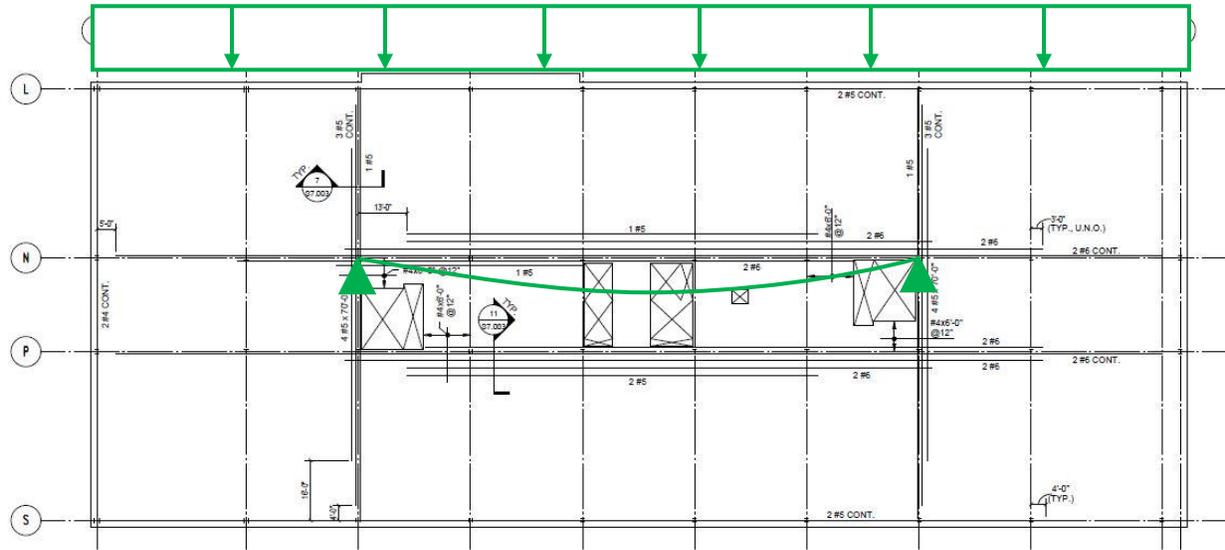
Floor Diaphragm Acting as a Beam Spanning Between Braced Frames
